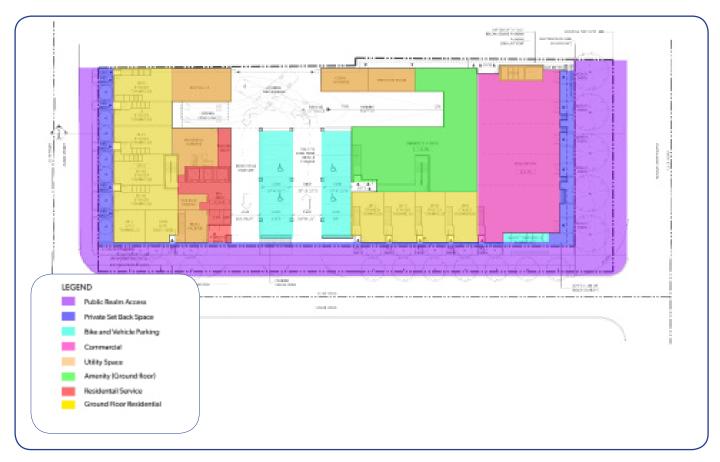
Site Organisation Diagram: Site Plan Prepared by Studio JCI.
